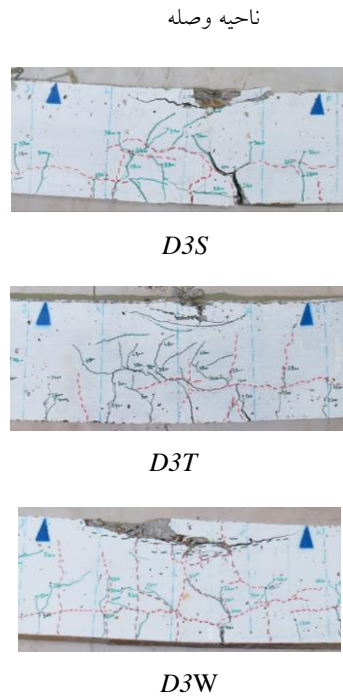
Crack pattern in specimens contained three stirrups in lap spliced zone
